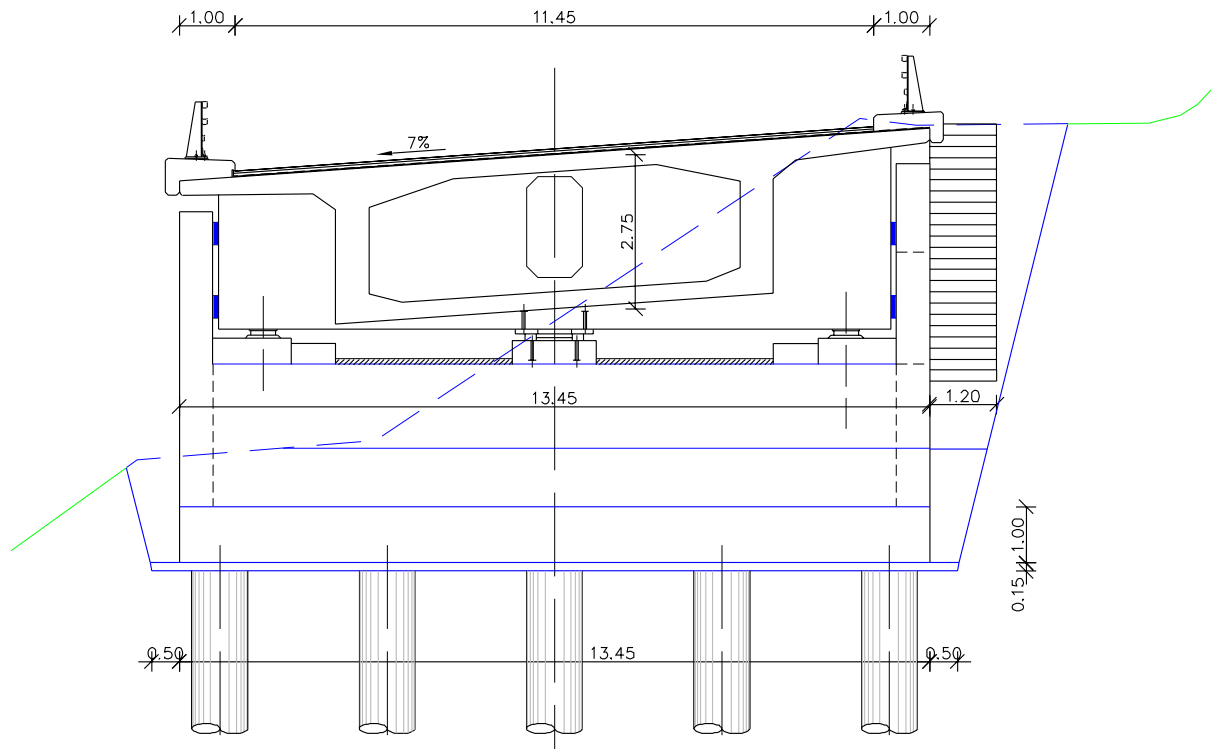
Abutment – bridge connection details (all dimensions in meters).
